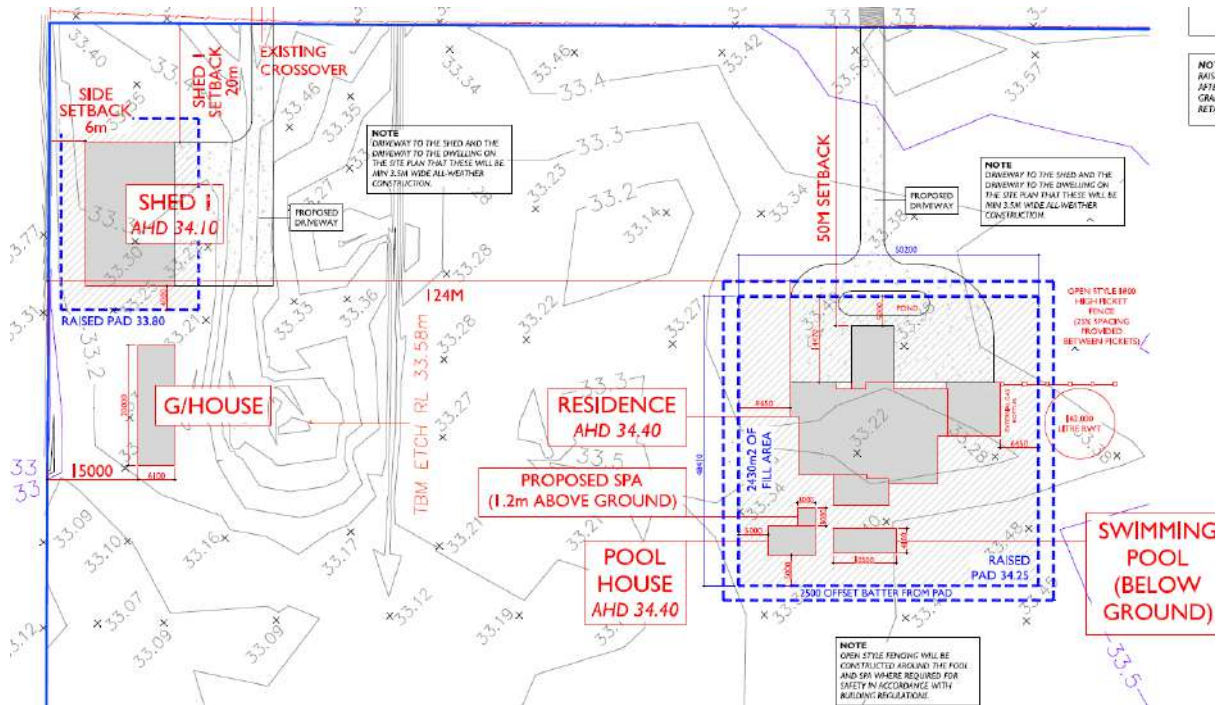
Extract of Localised Site Plan, Jackson and Fapio Pty Ltd
